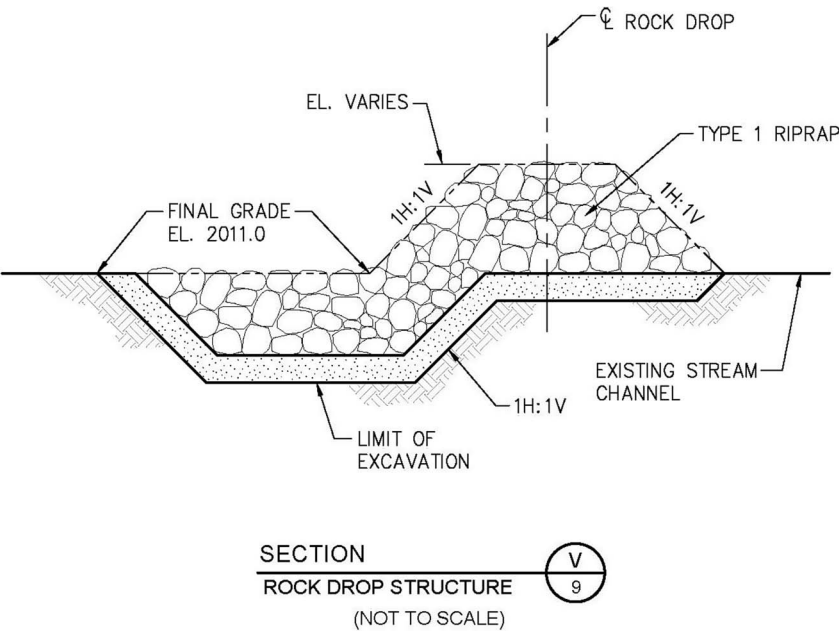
P-6. Section V Rock Drop Structure, before Dimensioning
